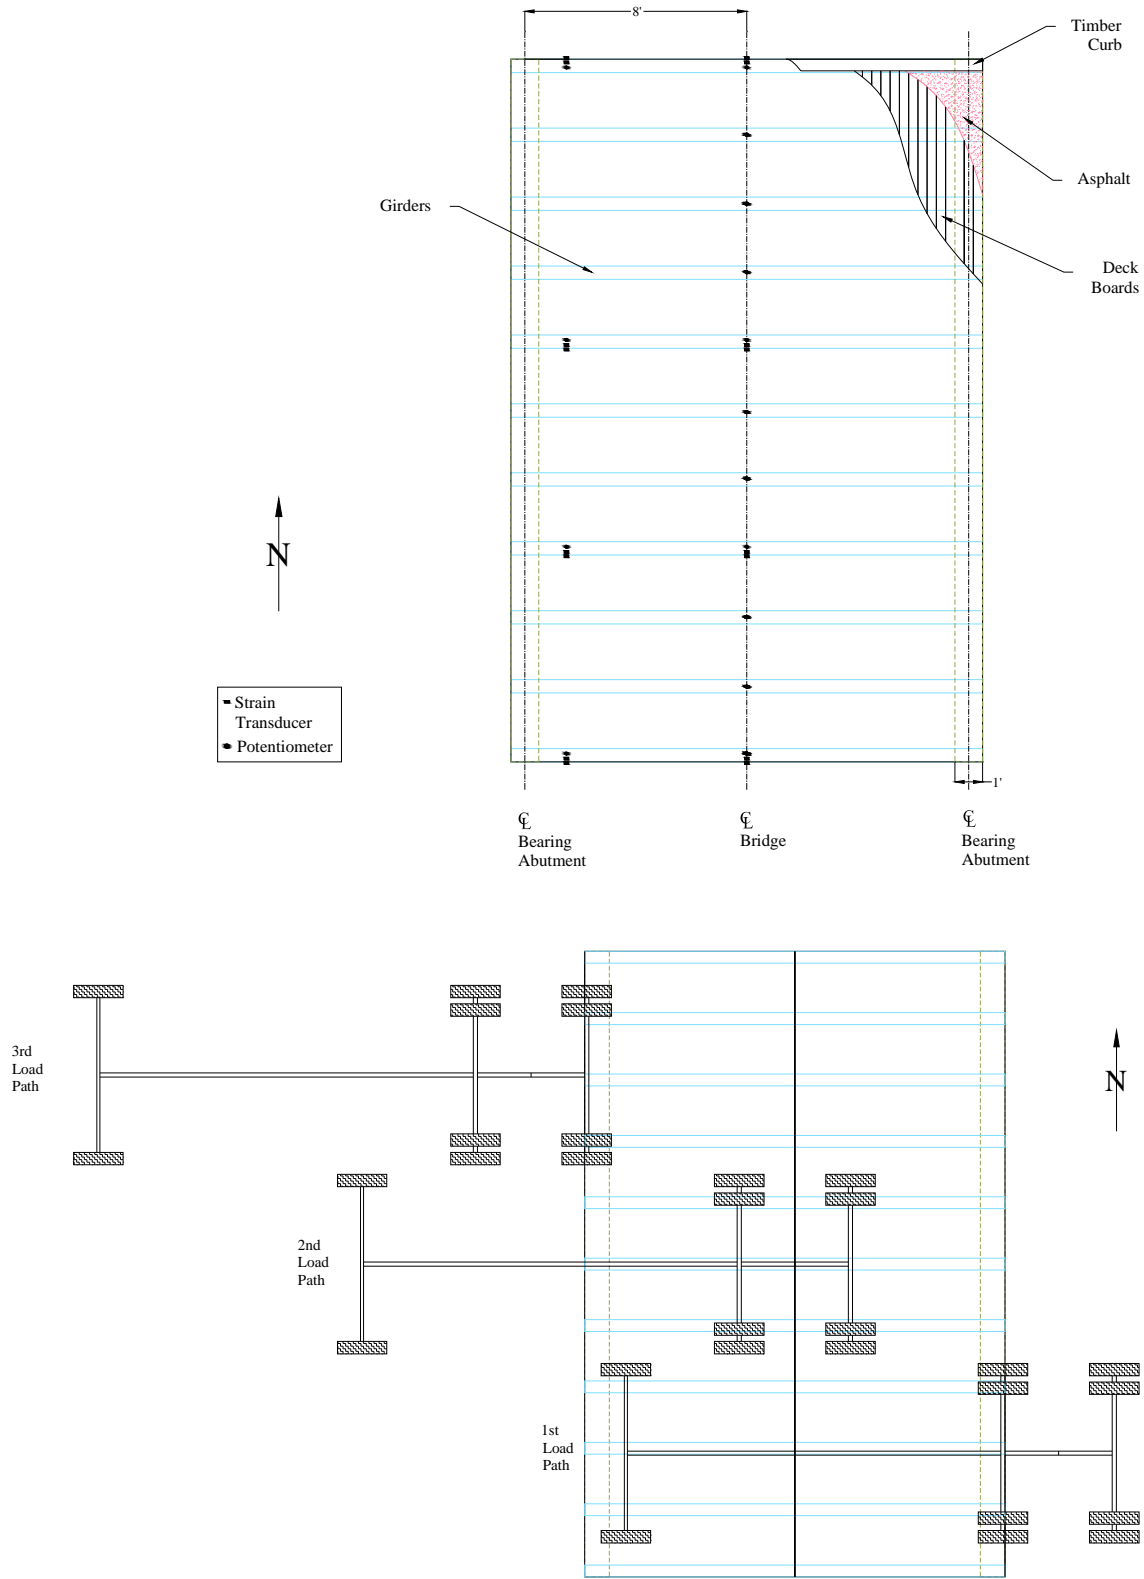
Instrumentation and Load Paths of Colorado Bridge
